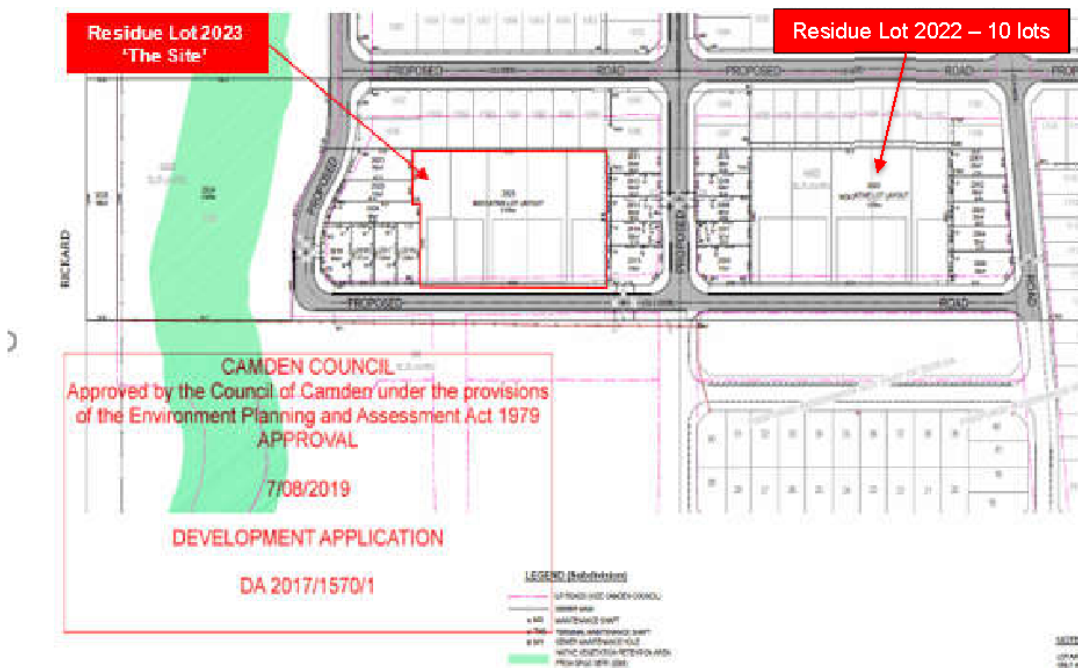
approved subdivision under DA1 – parent subdivision 2017/1570/1
